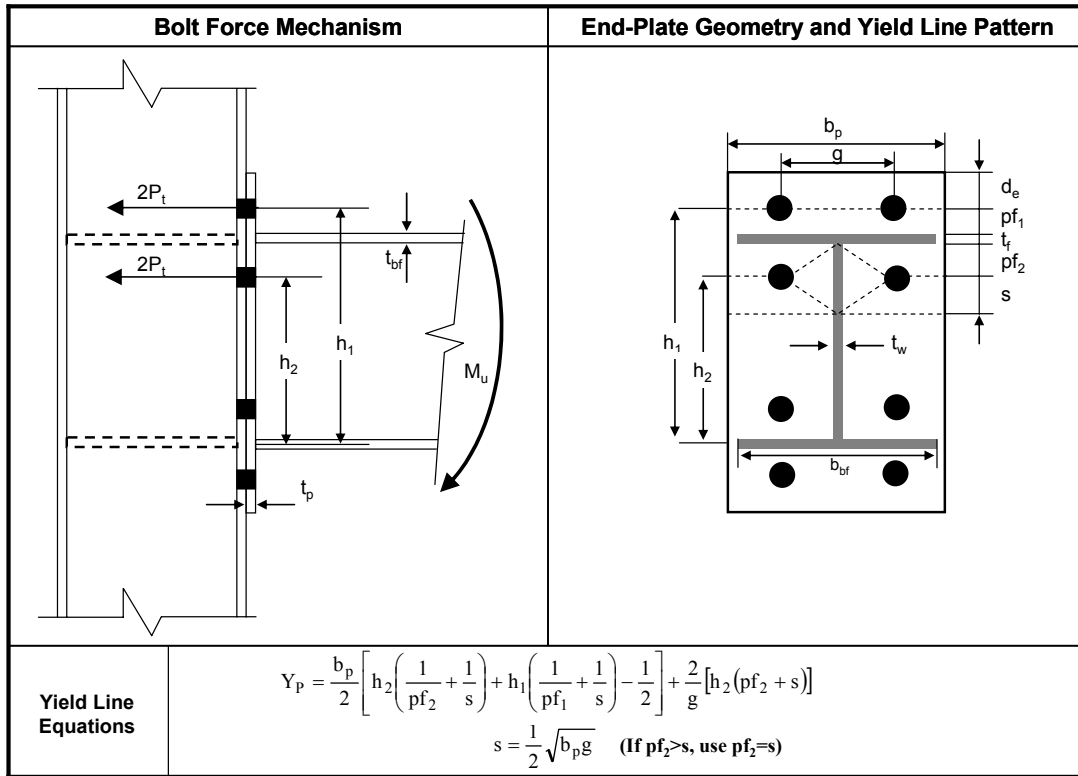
Geometry summary and yield line failure mechanism (4 Bolt Stiffened, 4ES)
